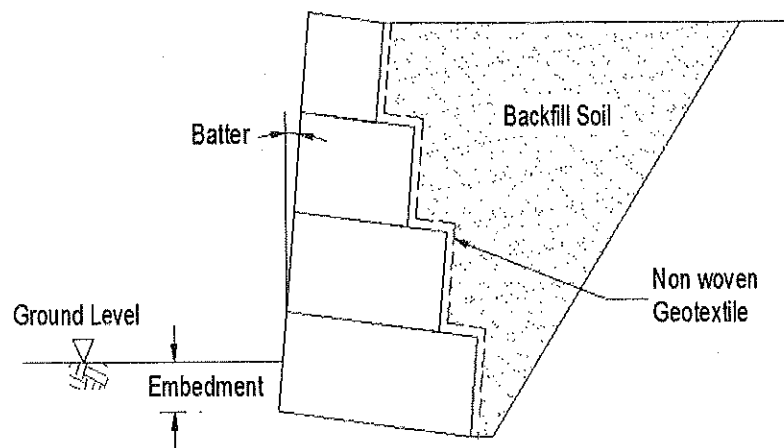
Typical Cross Sections of Gabion Wall with batter Angle
